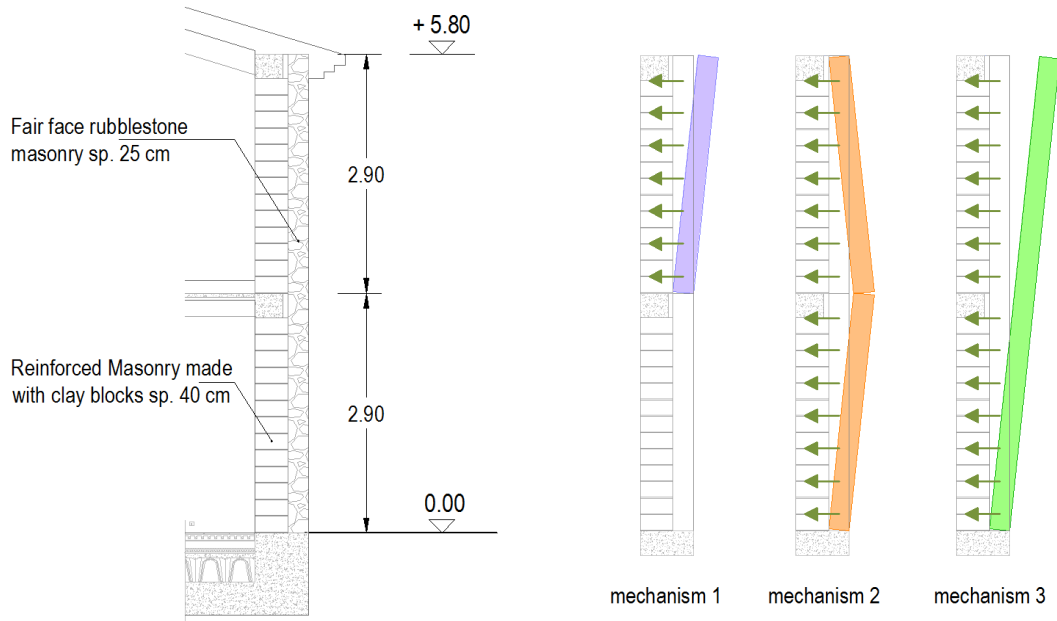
Vertical section of the external double-leaf masonry wall and schemes of the significant collapse mechanisms.
